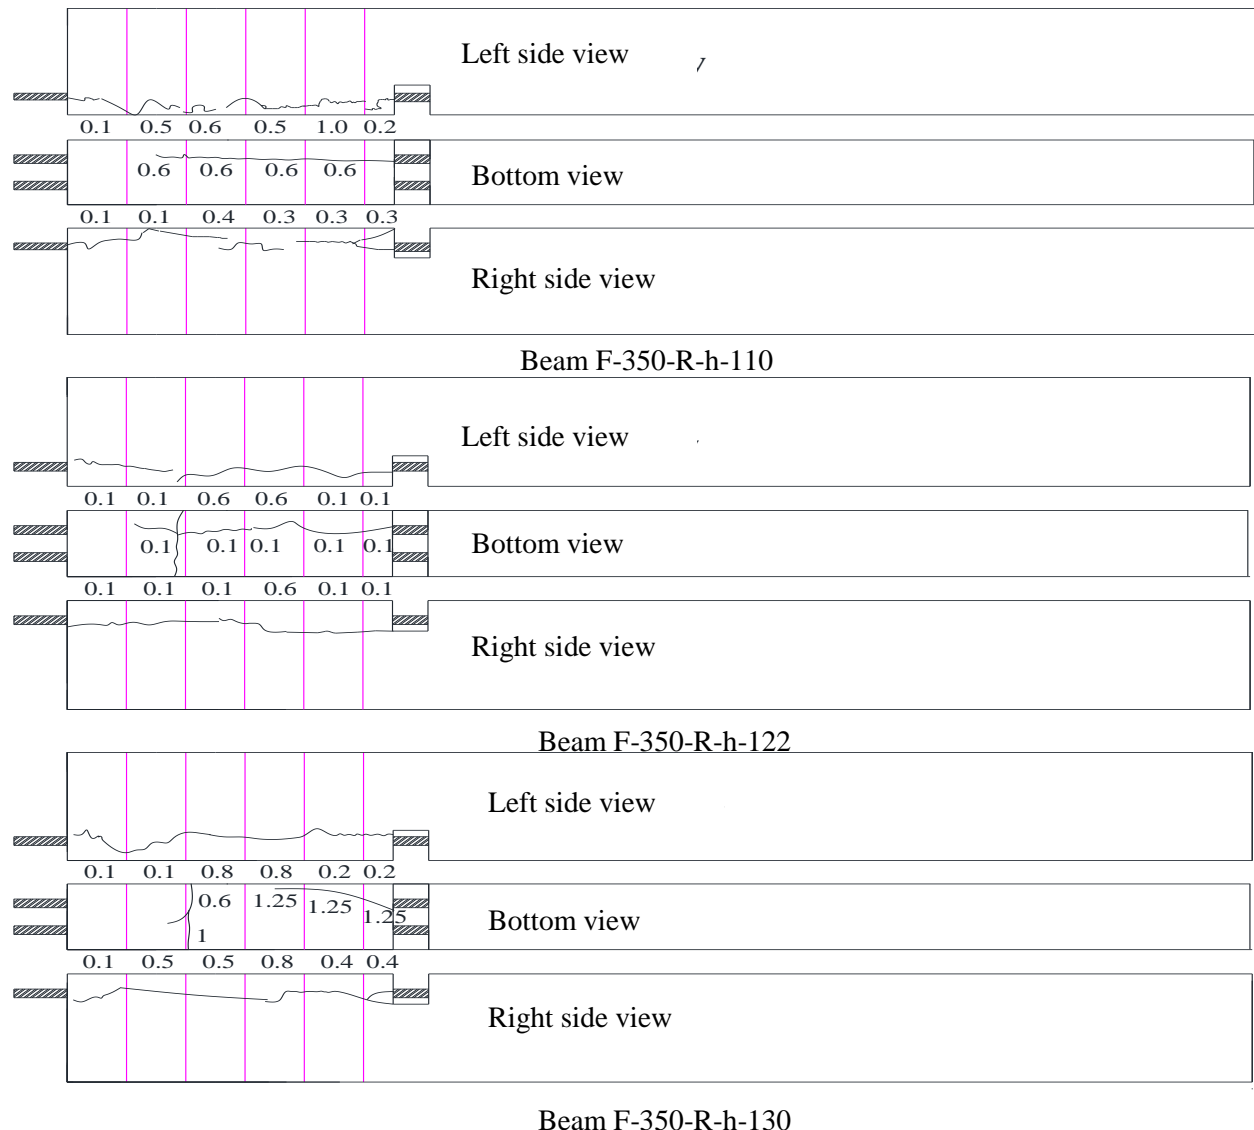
Schematic drawing of the corrosion cracks for the beams from set 2 (350 mm anchorage length) corroded to a high corrosion level and tested for fatigue (Set 2 – Group R-h). The crack width measurements are given in mm.
